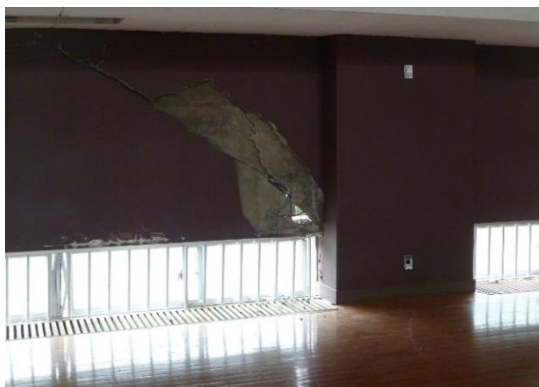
Shear cracking damage to concrete beam supporting mezzanine on side wall.
